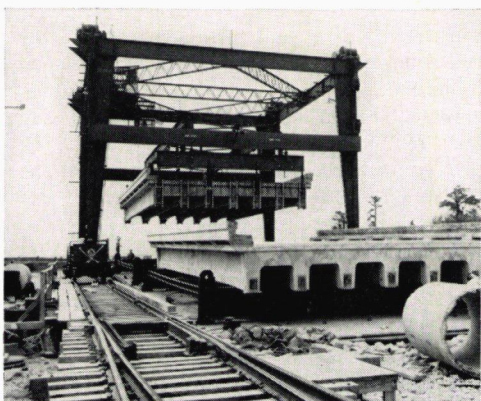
A 56-foot long precast prestressed deck slab being placed on barge.
